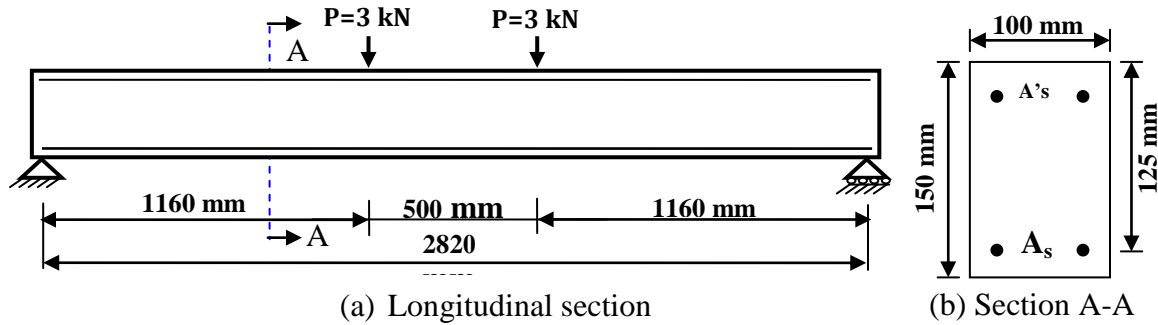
Geometry and reinforcement details of Beams (BS), (a) Longitudinal section, (b) Section A-A [20]
